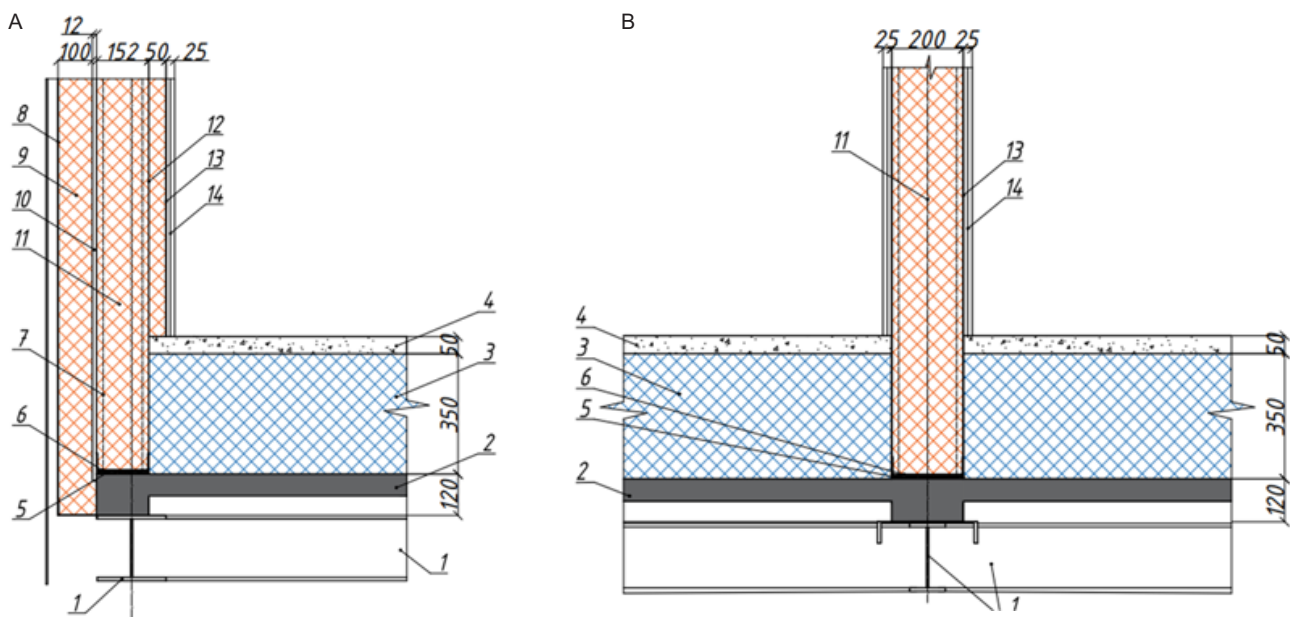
Typical solutions for joints of external (A) and partition (B) wall-basement slab connections:
